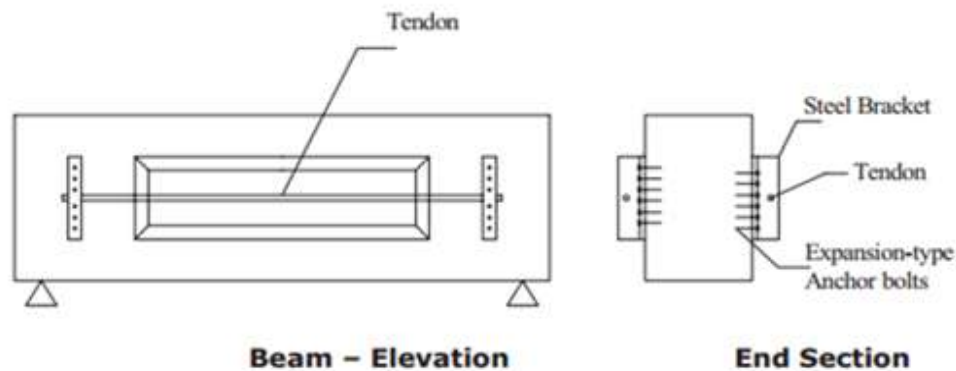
Anchoring of external prestressing using expansion-type anchor bolts.
